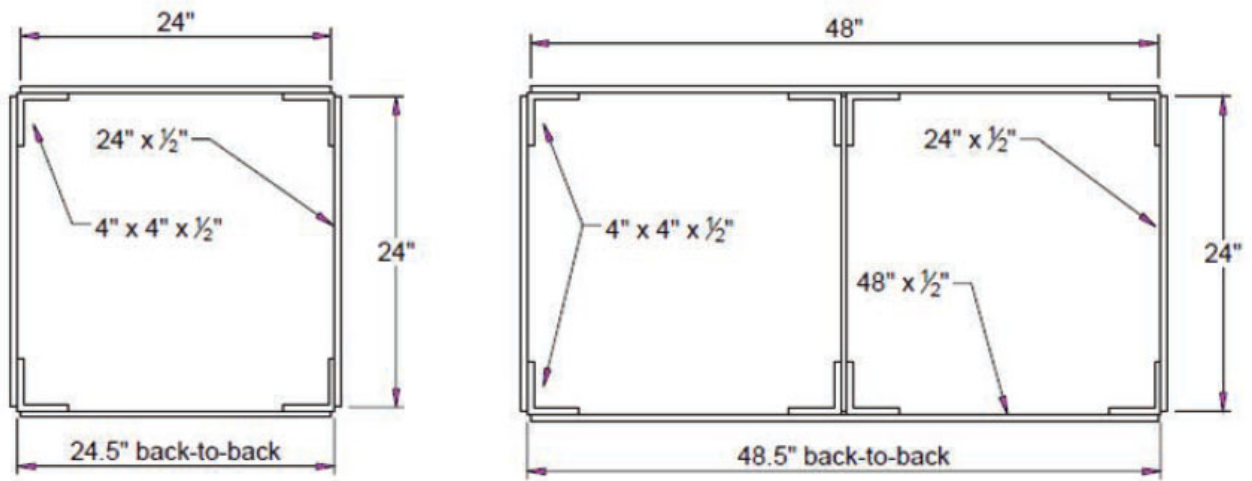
Cross-sections of pier/ arch columns and skewback columns.
